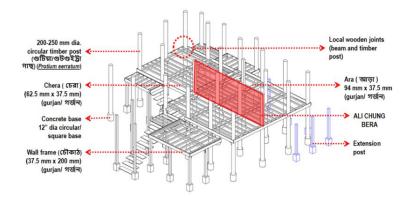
Structure of the elevated platform of the Stilt timber Timber house
